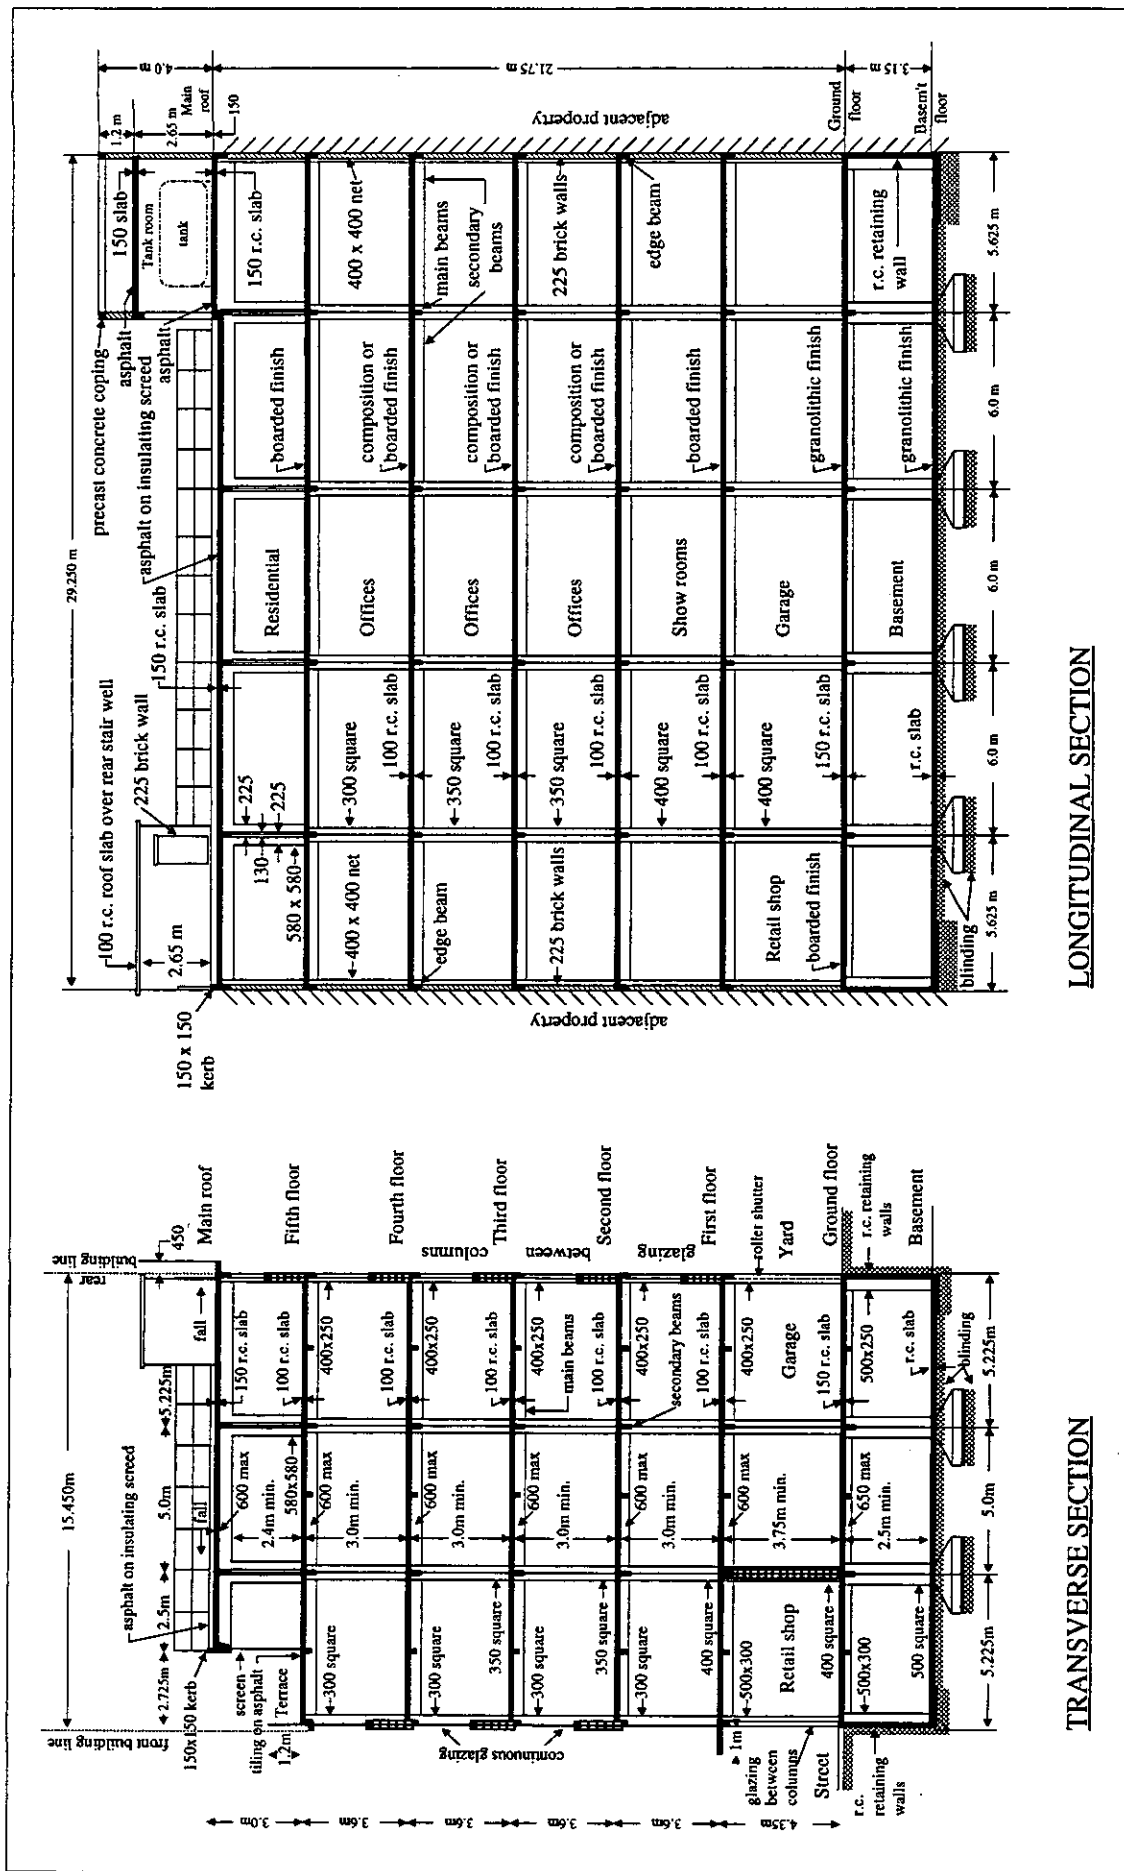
Concrete Framed Building Dimensions - Moment Resisting Frame: General Arrangement -Sections
